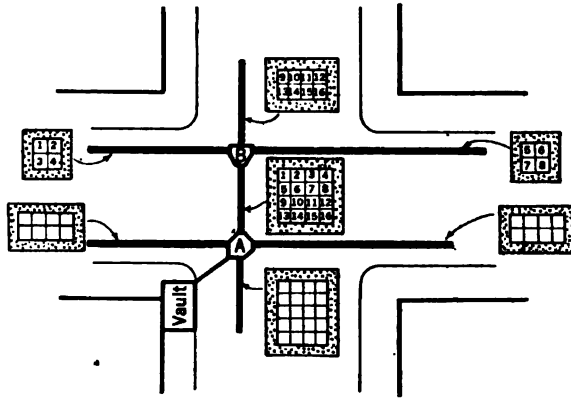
ARRANGEMENT OF CONDUIT AND MANHOLES AT STREET INTERSECTION
